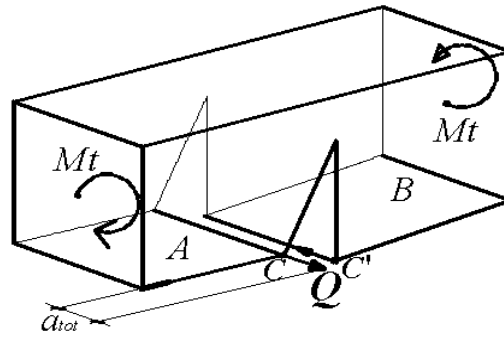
Scheme of a reinforced concrete element with a normal crack subjected to torsion.
